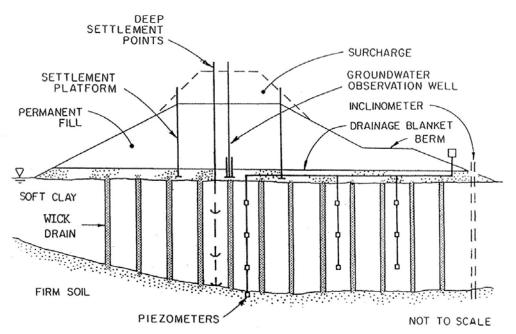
PVD Installation showing typical instrumentation and monitoring.
